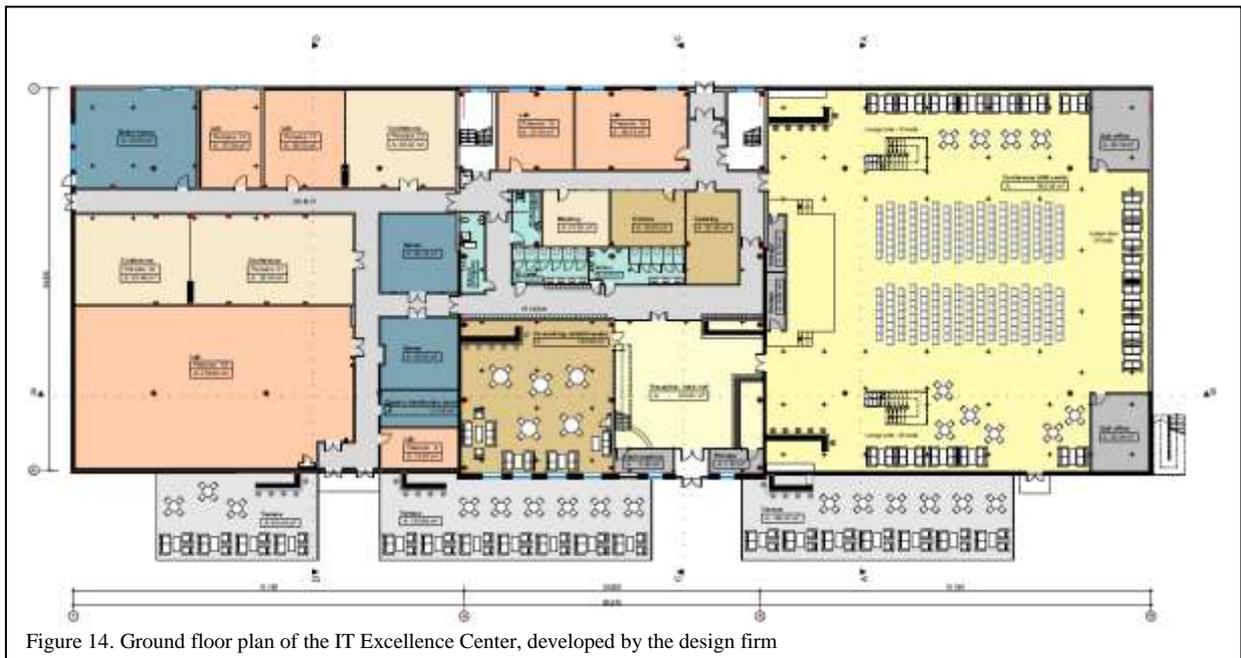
Ground floor plan of the IT Excellence Center, developed by the design firm
